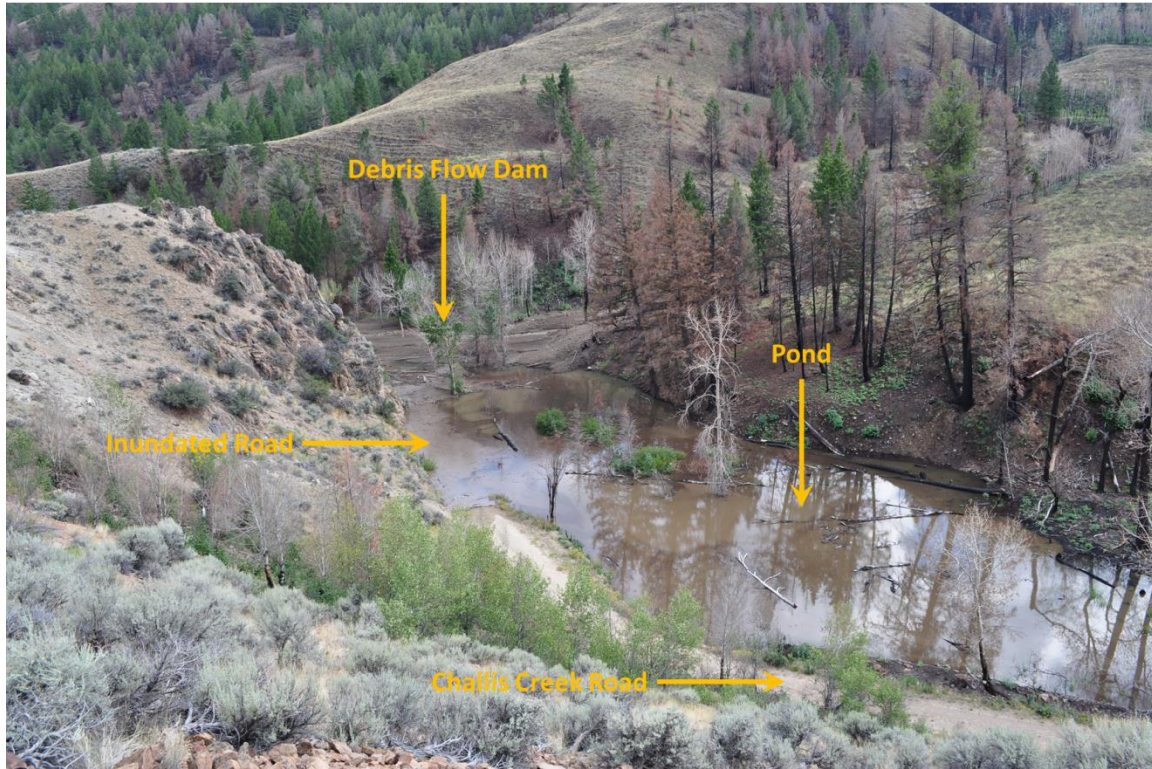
The debris flow dam, pond, and inundated section of the Challis Creek Road at Site #1 (photograph taken on August 18, 2014).
